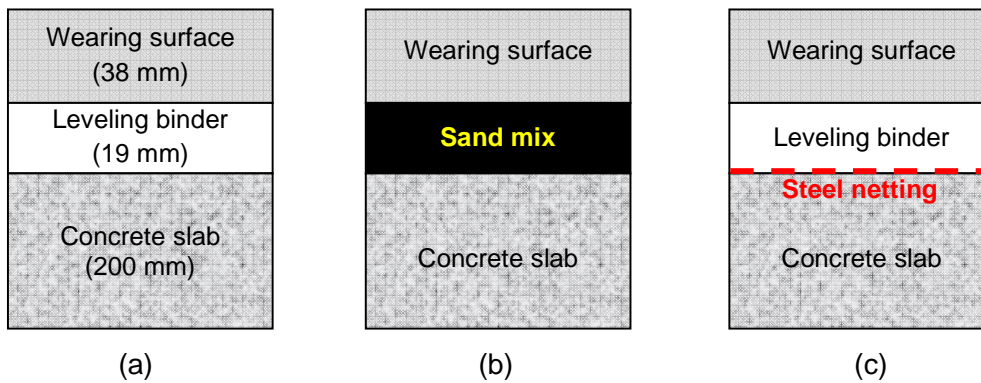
Alternative HMA overlay designs: (a) control section, (b) sand mix section, and (c) steel reinforcement section.
